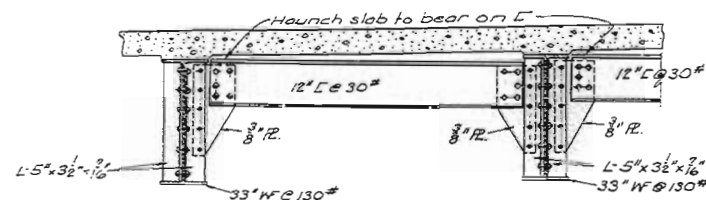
DETAIL OF STRINGER CONNECTION TO FLOORBEAM
